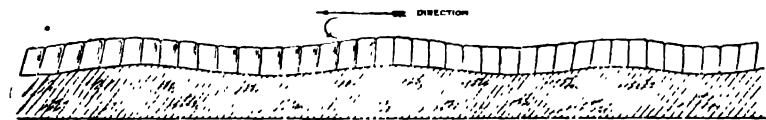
Wave Formation on Sett-paved Road on a Non-Rigid Foundation.
